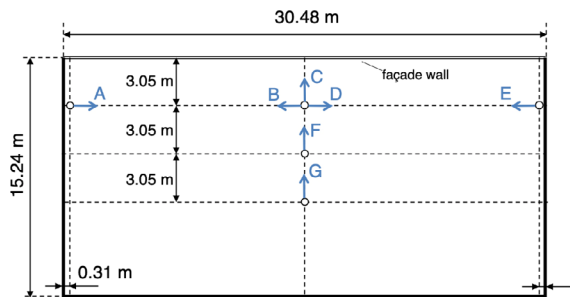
Floor plan view showing position of the seven glare calculation viewpoints (A to G) inside the space
